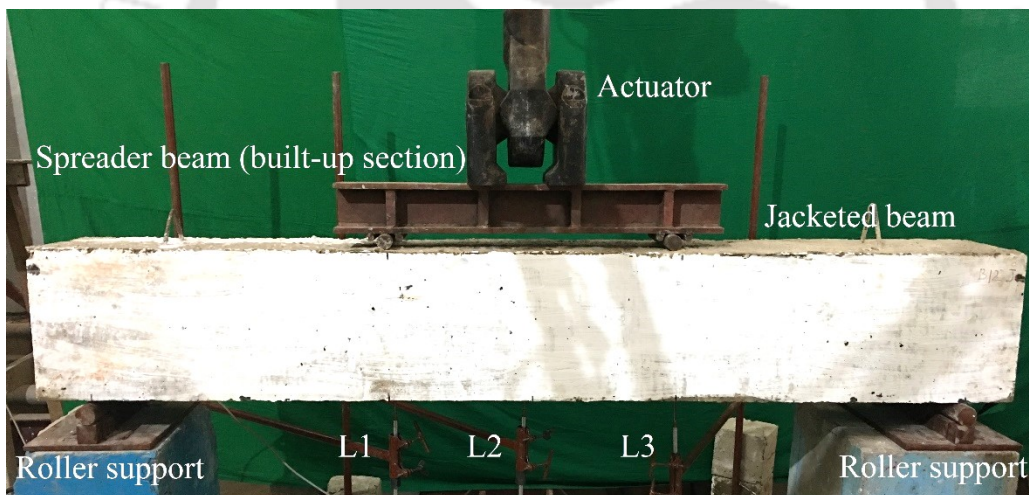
Setup for static flexural four point loading test of jacketed RC beam.
